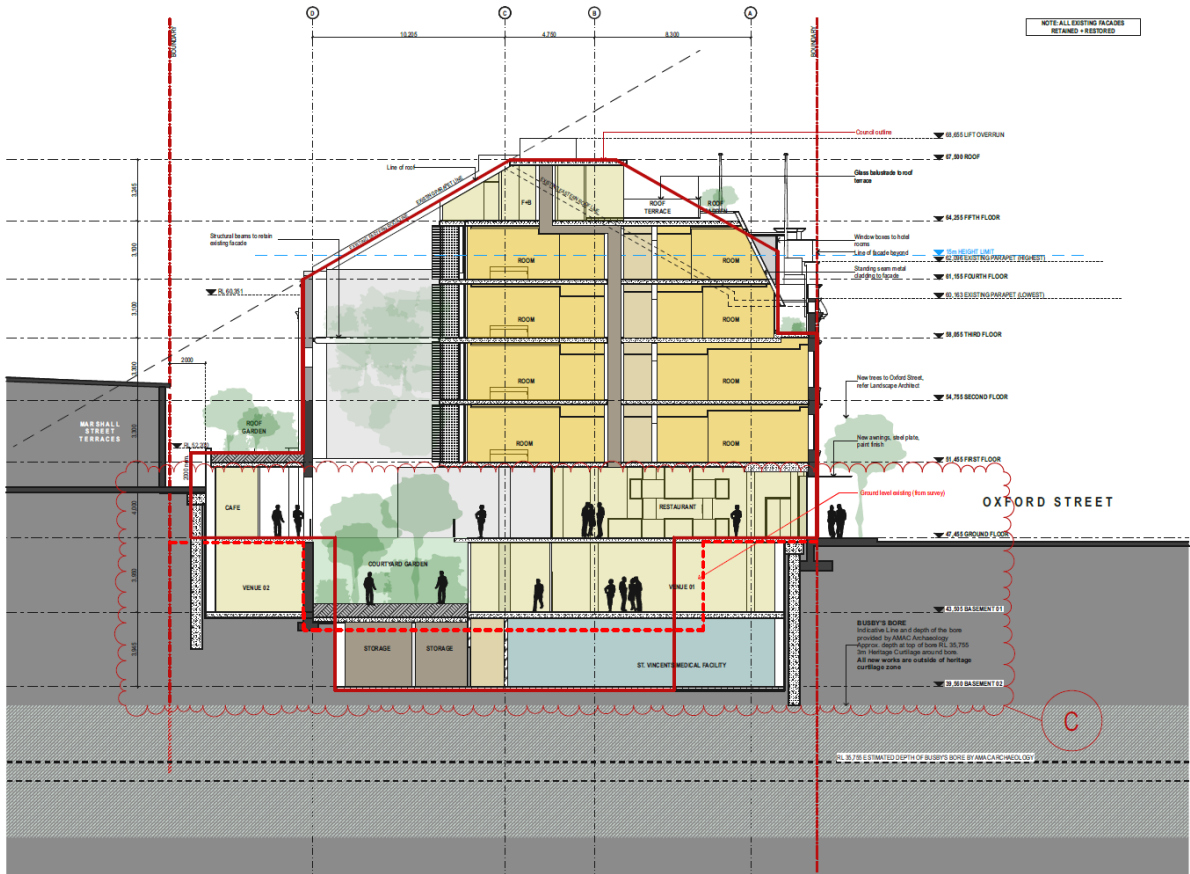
Cross section of the indicative concept design. Drawing pp.12
